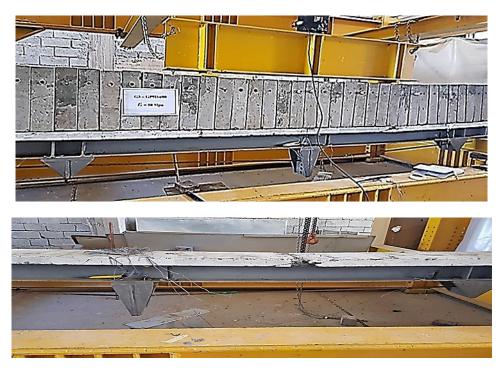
The Mode of Failure of the Steel Girder (GP9D-e160) G3
